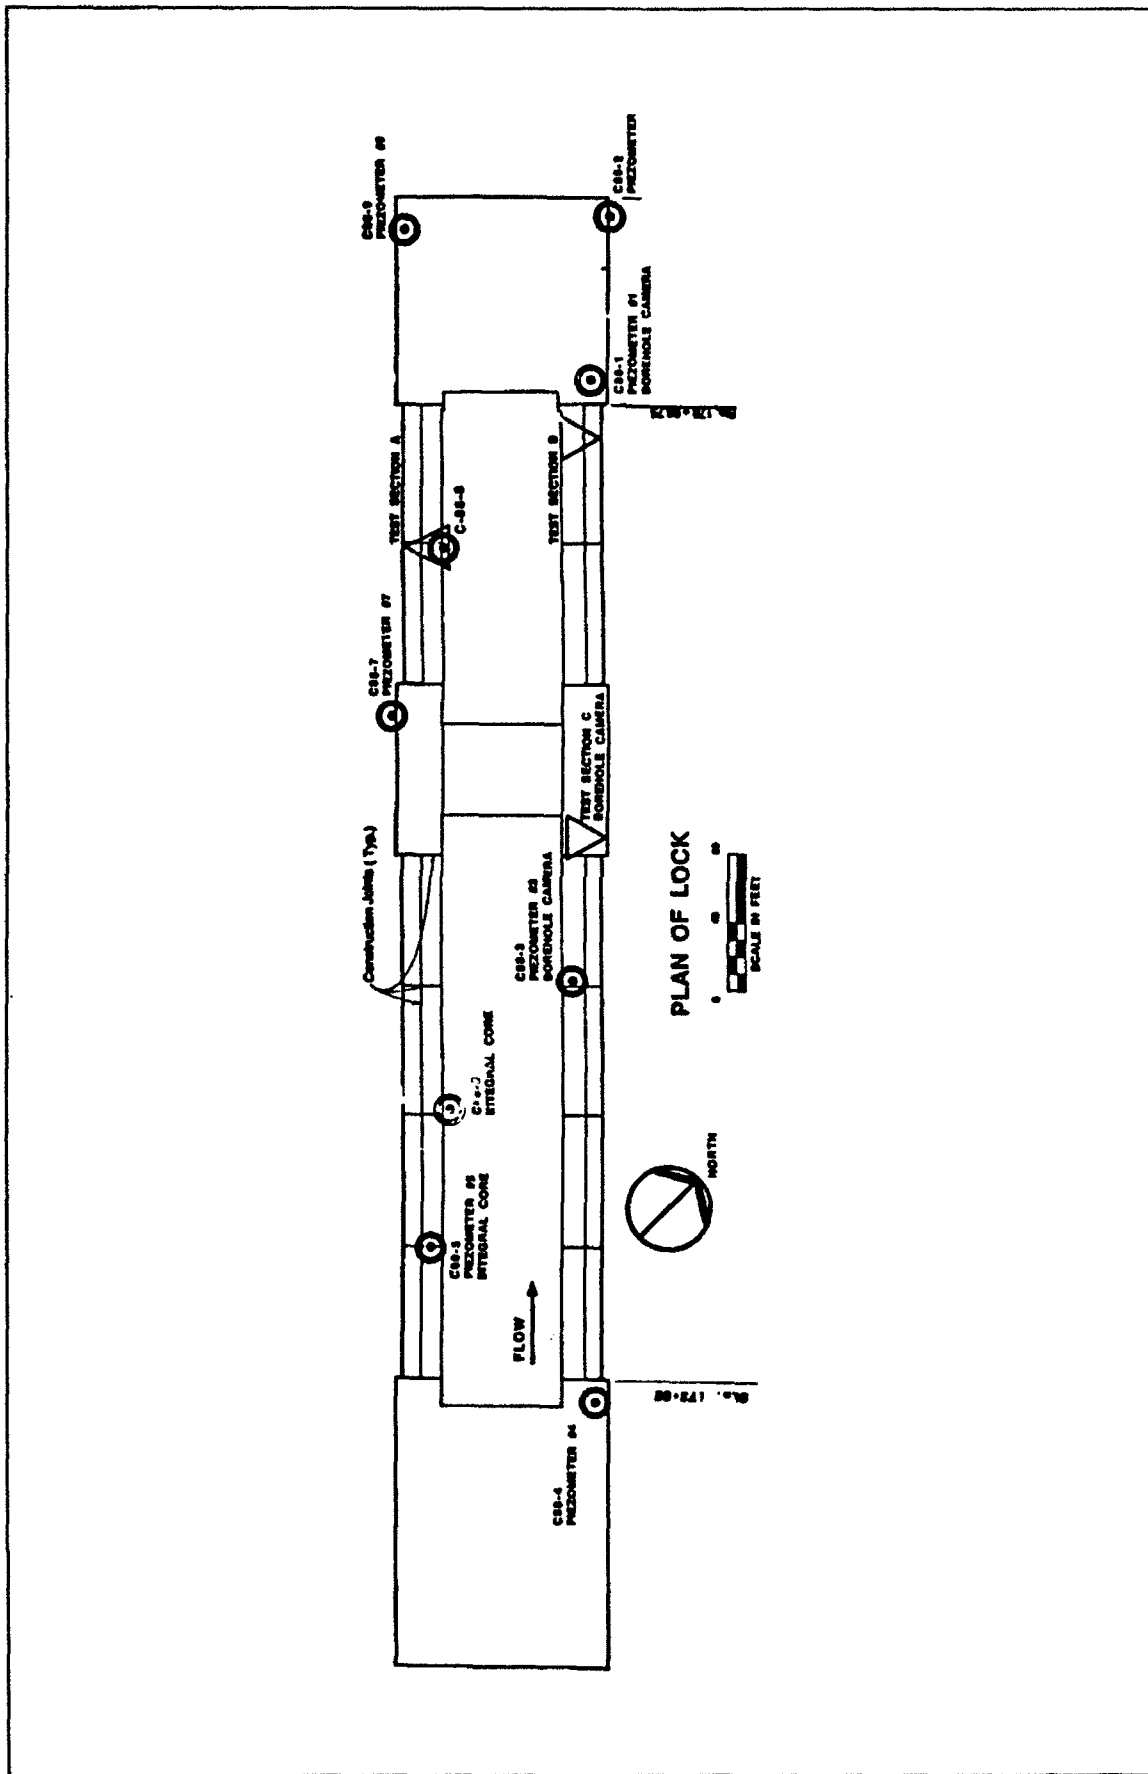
1988 Plan of subsurface explorations and location of test grout sections
